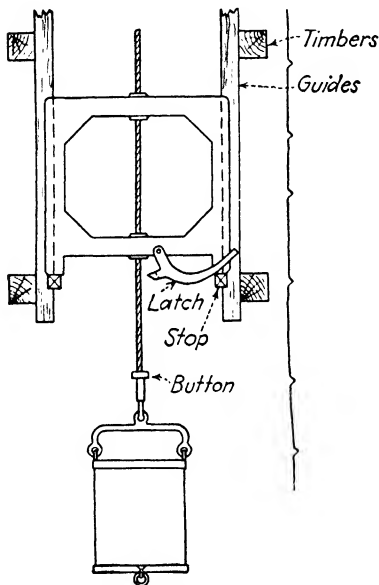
Detachable crosshead or gilly for guiding bucket through shaft timbering. The gilly stops at the bottom of the timbering.
